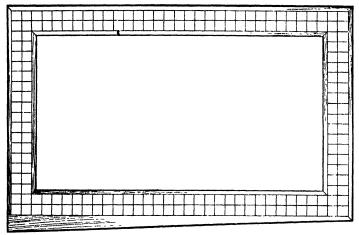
How Room with Wall Out of Square can have Surround Laid True.
